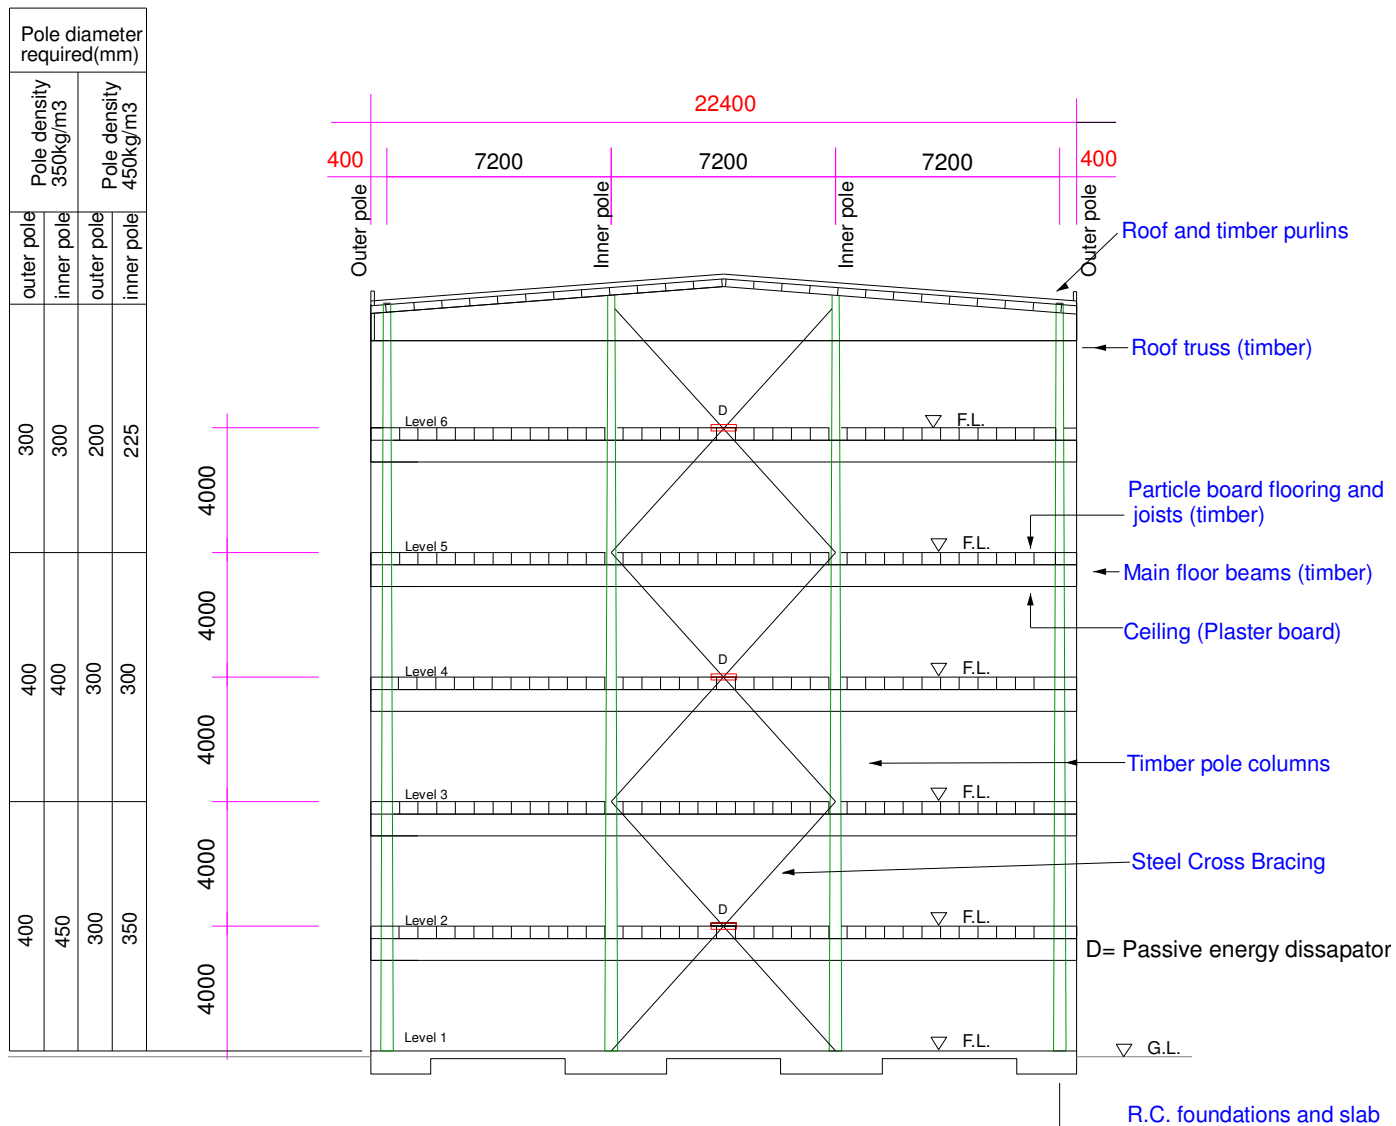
Timber Pole Multistorey Prototype Building Cross section
